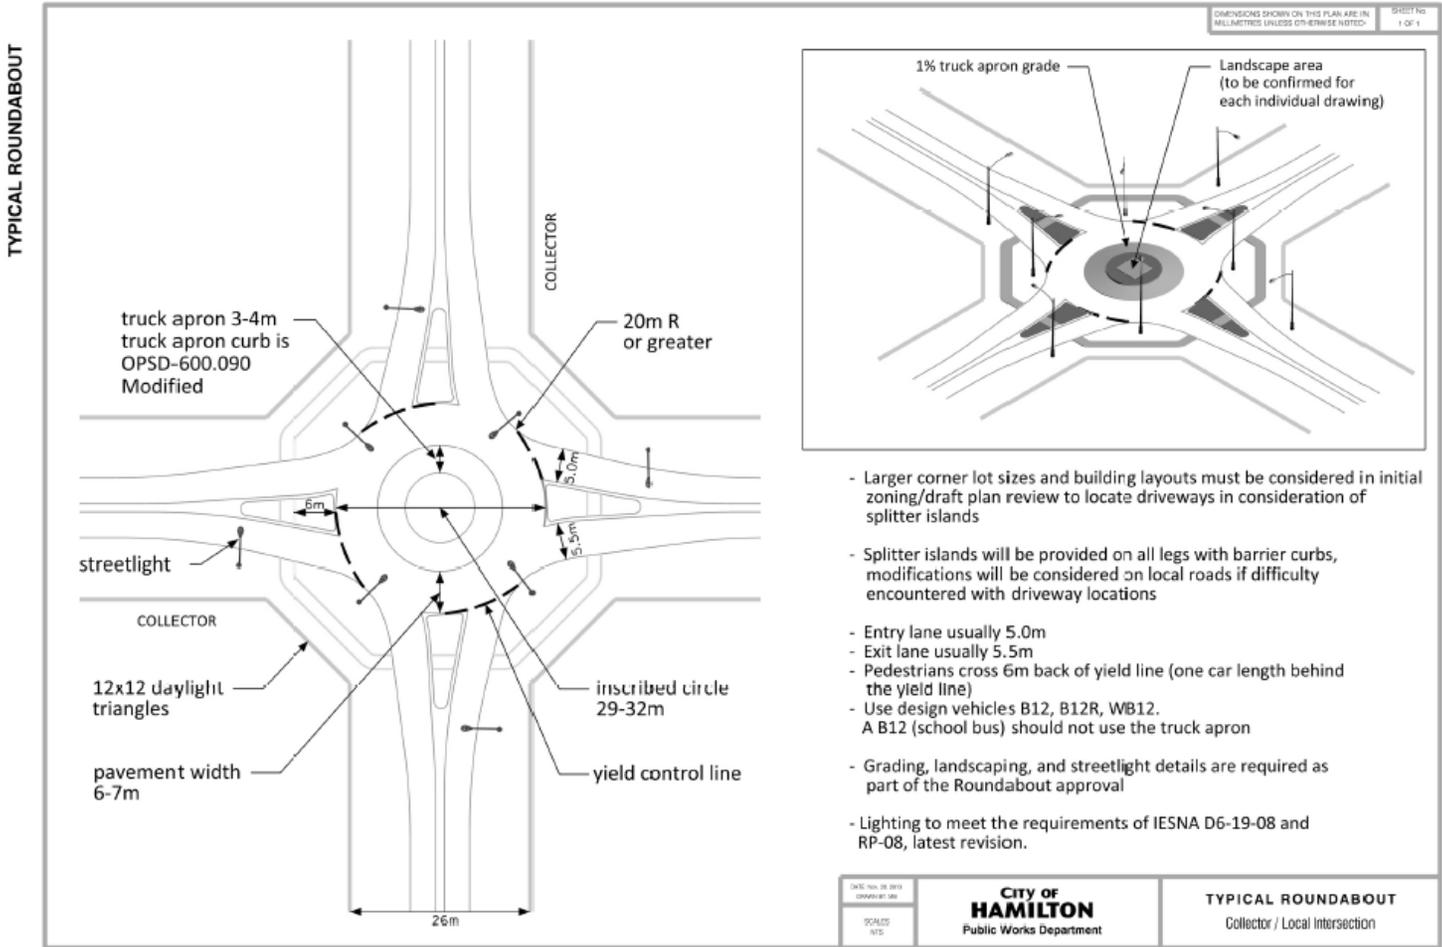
Typical Roundabout RIGHT-OF-WAY CROSS SECTION
